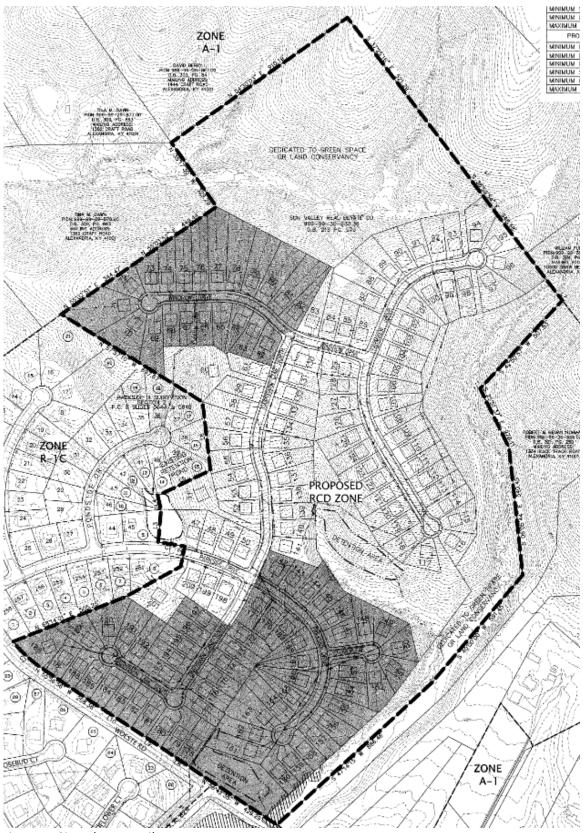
Site Plan Detail13. A schedule of development will be requested with Stage 2 plans.
